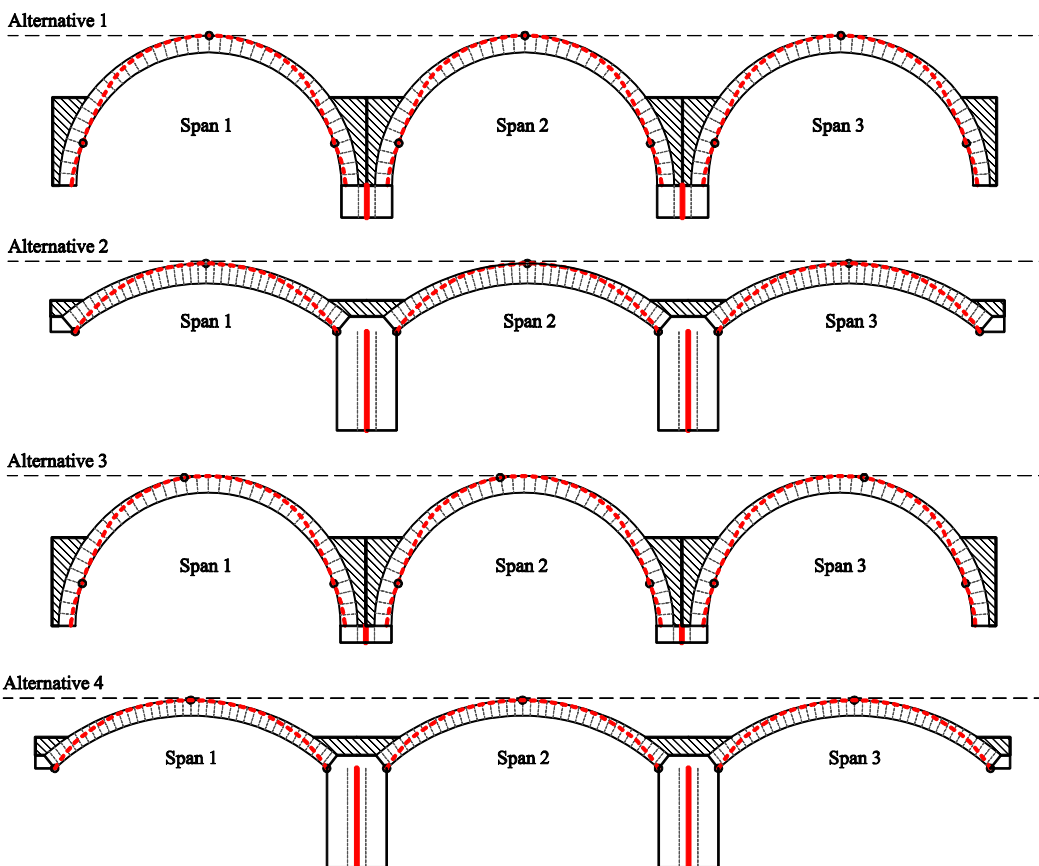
Elevation sketches of the four studied alternatives for Velilla del río Carrión Bridge.
